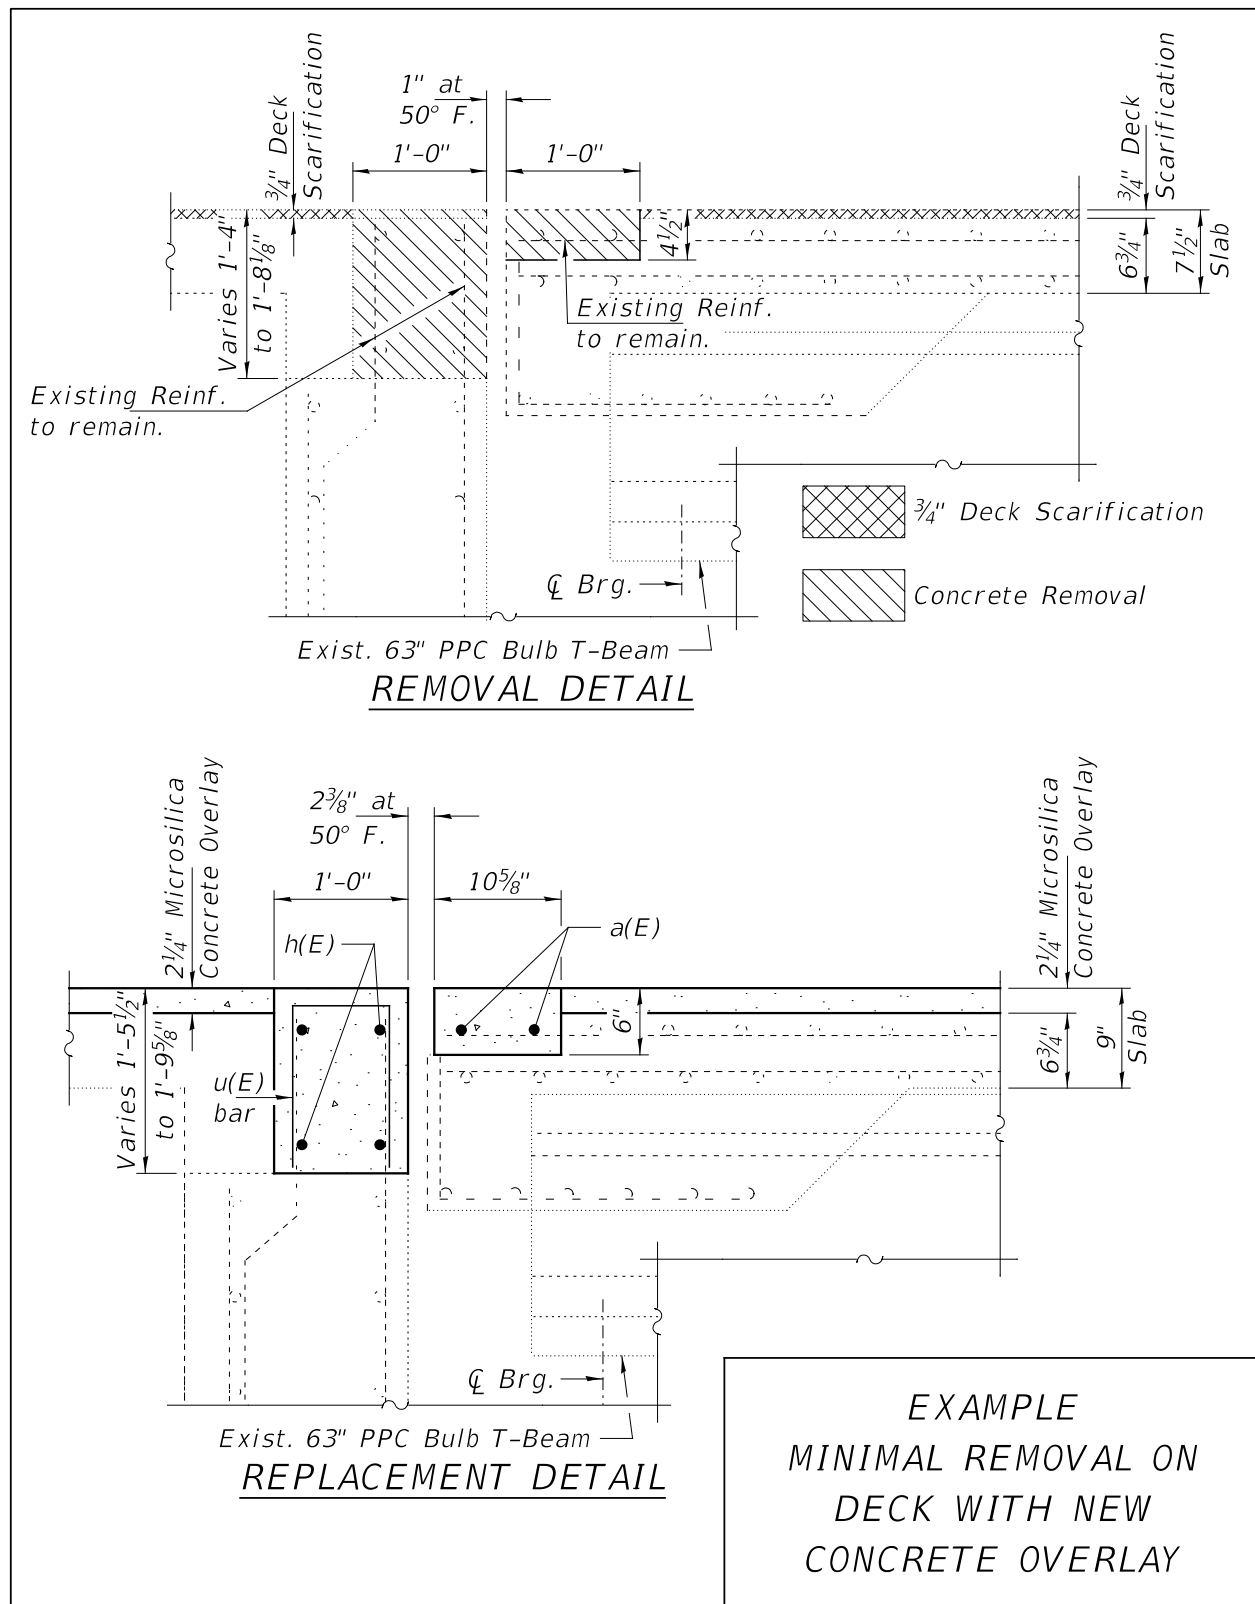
Example – Minimal Removal on Deck with New Concrete Overlay
